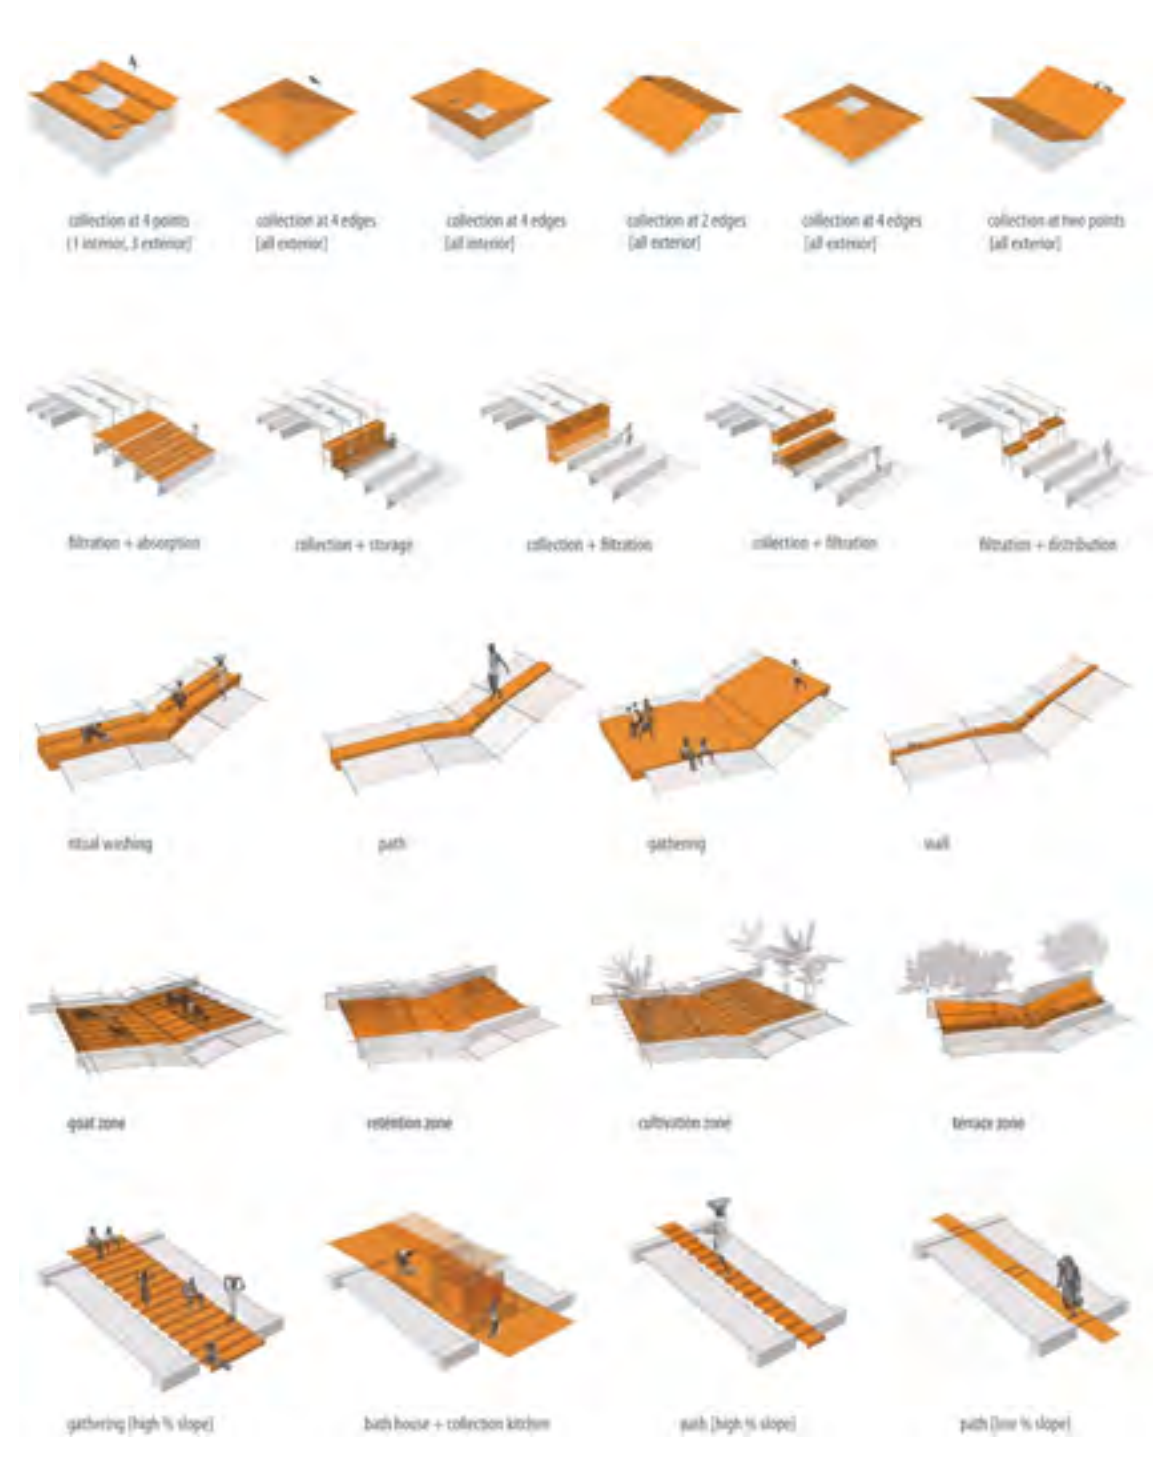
Constructed systems: roof, edge, weir, ground, and ridge.
